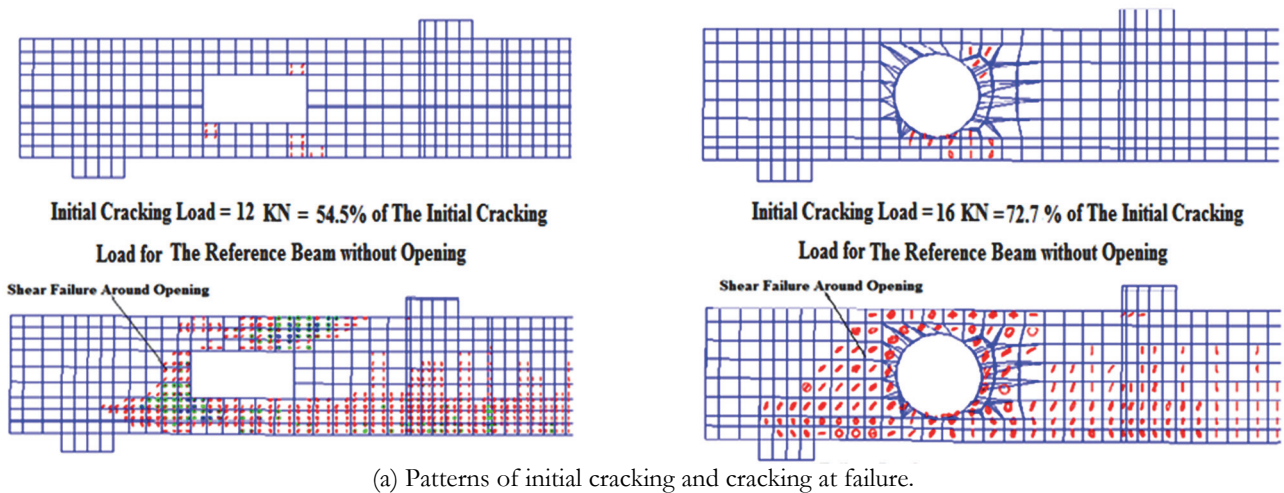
Structural status details of the un-strengthened control beams models UR00 and UC00 drilled under no service loads.
